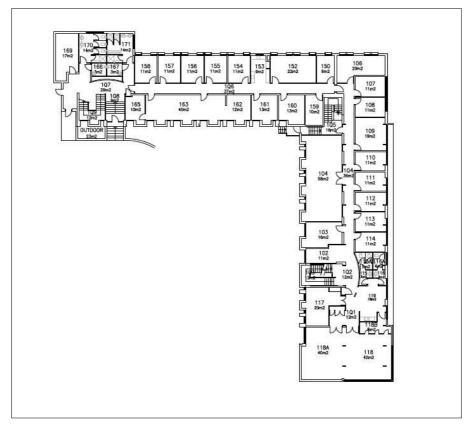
Level 1 UNSW Information Services. Plan last modified: March 2013.
